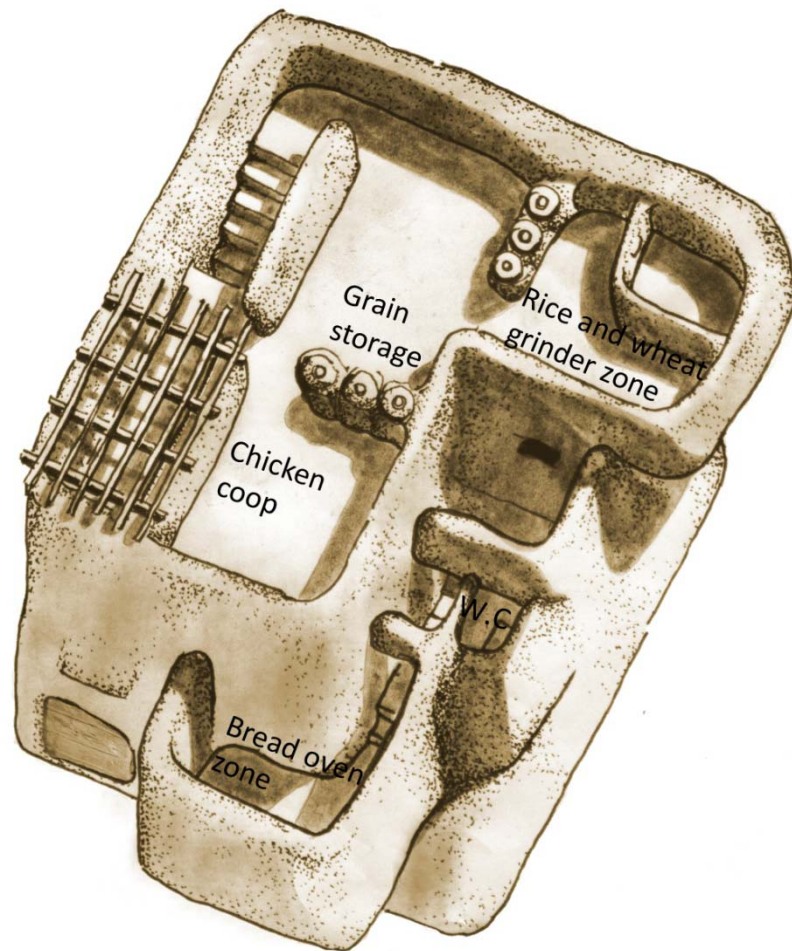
3D model of the small-family house showing roof floor functional spaces.
